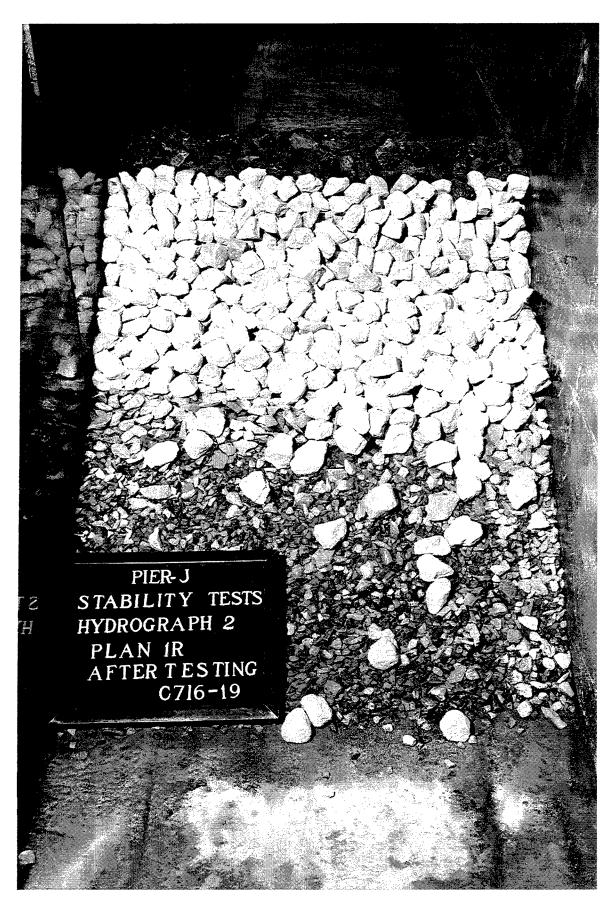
Harbor-side view of Plan 1R after testing step 5 of Hydrograph 2
